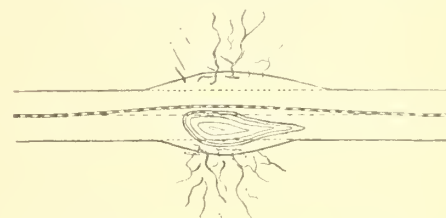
Plan of Sink Hole Showing Distortion in Alignment, and Cracks at Sides.
